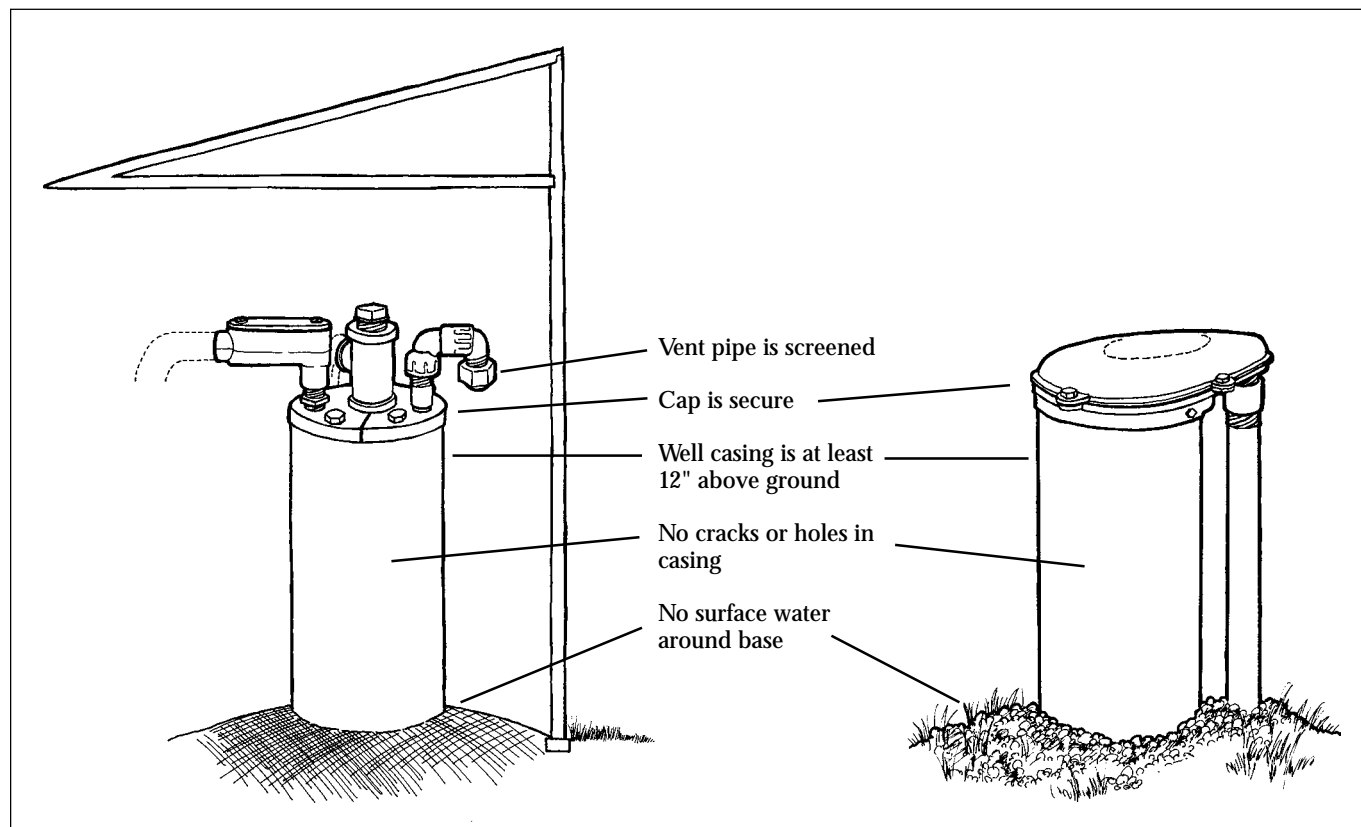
A properly constructed well protects against contaminants entering your drinking water system.
